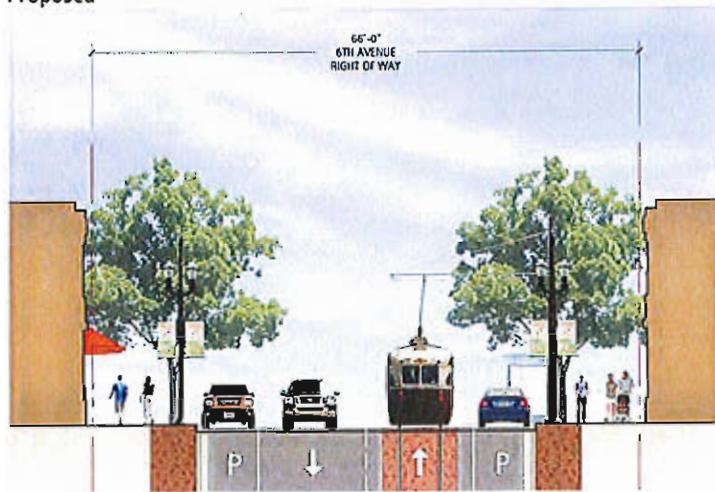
Envisioned 6th Avenue Streetscape, with Northbound shared travel lane
